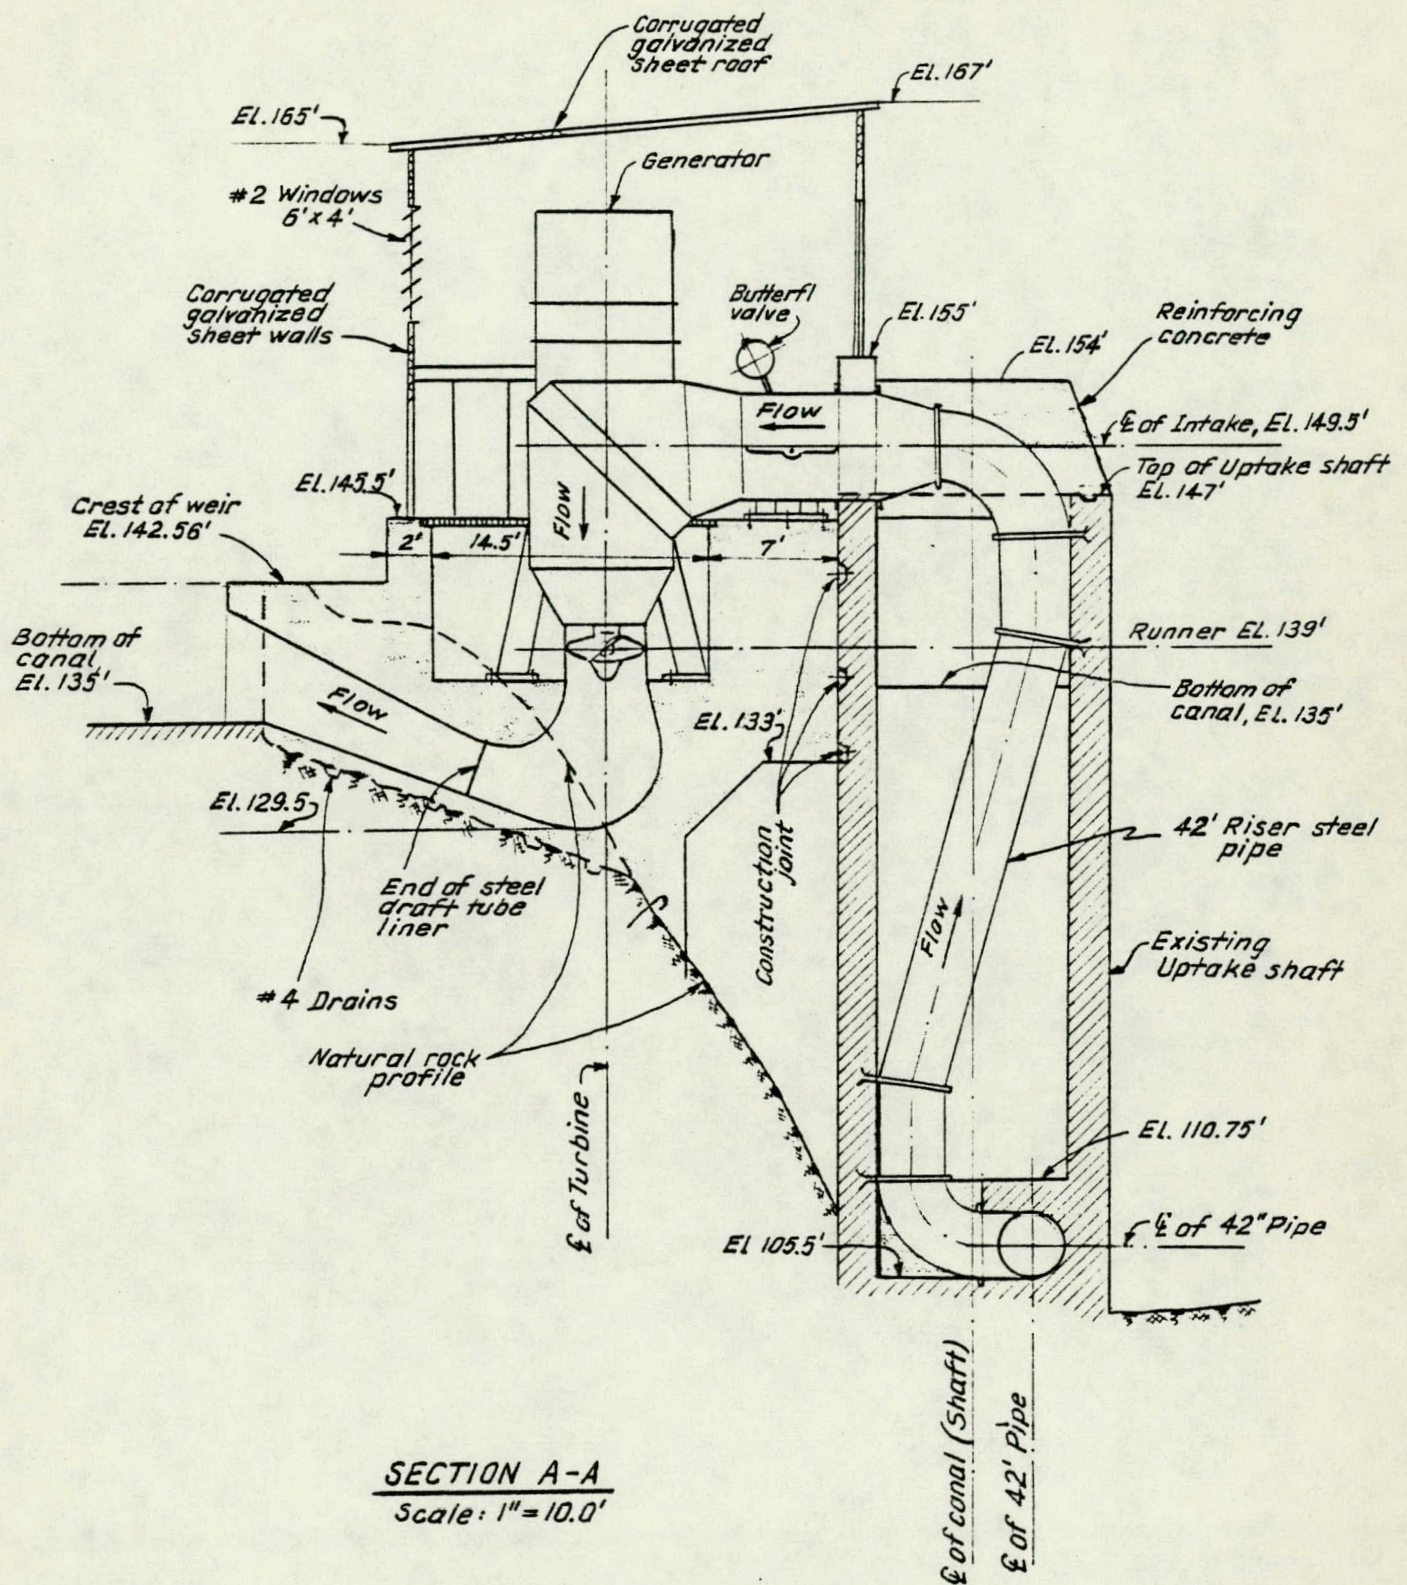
RETROFIT HYDROPOWER INSTALLATION AT EARTH DAM OUTLET STRUCTURE
